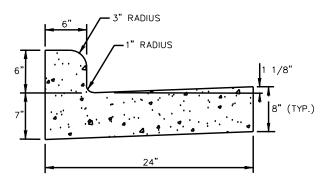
DETAIL FOR COMPUTING INLET ELEVATIONS SCALE: NONE
